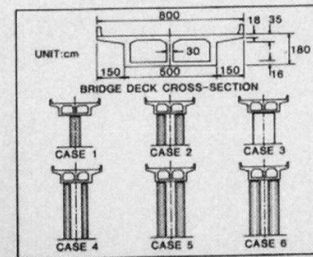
CROSS-SECTIONS OF EXAMPLE FOUR-SPAN BOX-GIRDER BRIDGES
